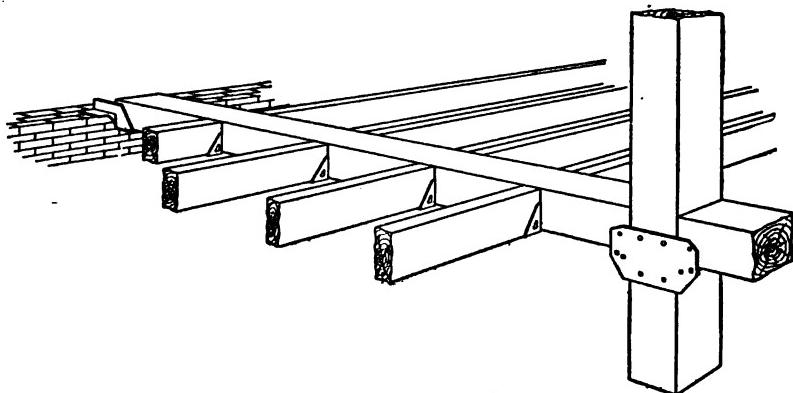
Mill-Construction Adapted to Stores, Office-Buildings, Etc.
